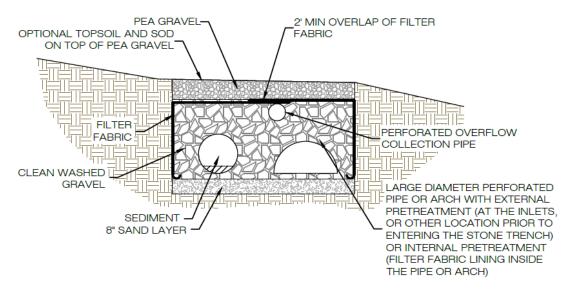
A: Infiltration Section with Supplemental Pipe Storage
